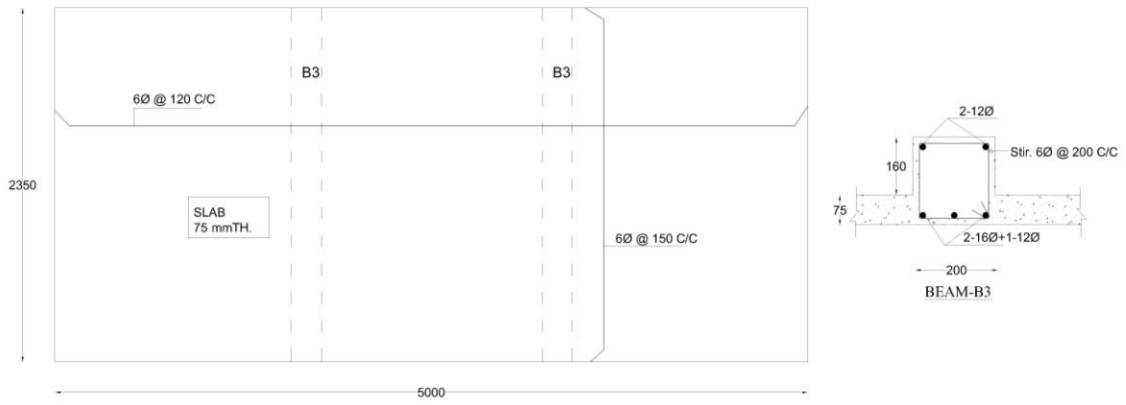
Reinforcement Detailing of Slab, 3PNR
